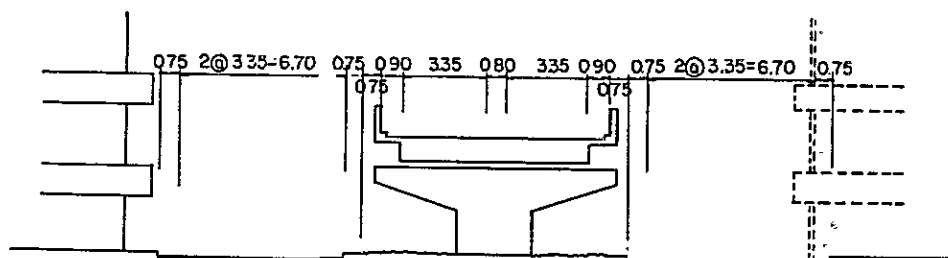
ALTERNATIVE CROSS SECTION FOR VIA BRASIL FLYOVER
